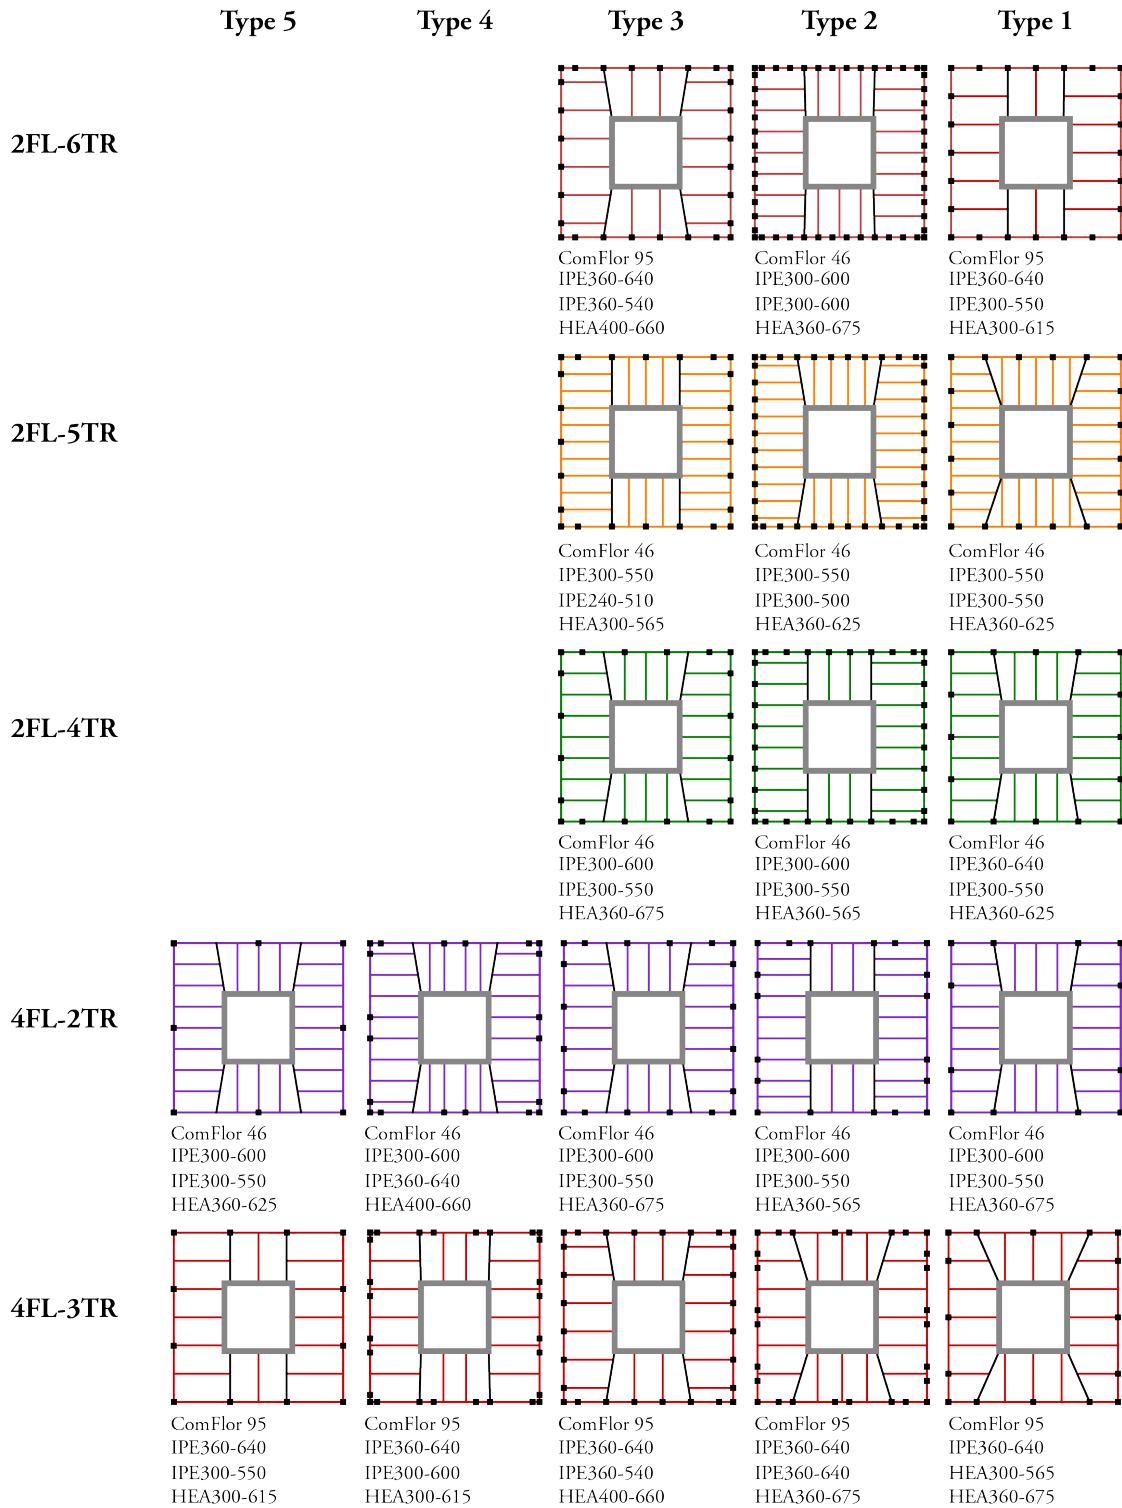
Overview of the composite floor configurations for the 150-meter diagrid models. The castellated beams are indicated as IPE300-600 where IPE300 is the original profile and 600 is the height of the castellated beam.
